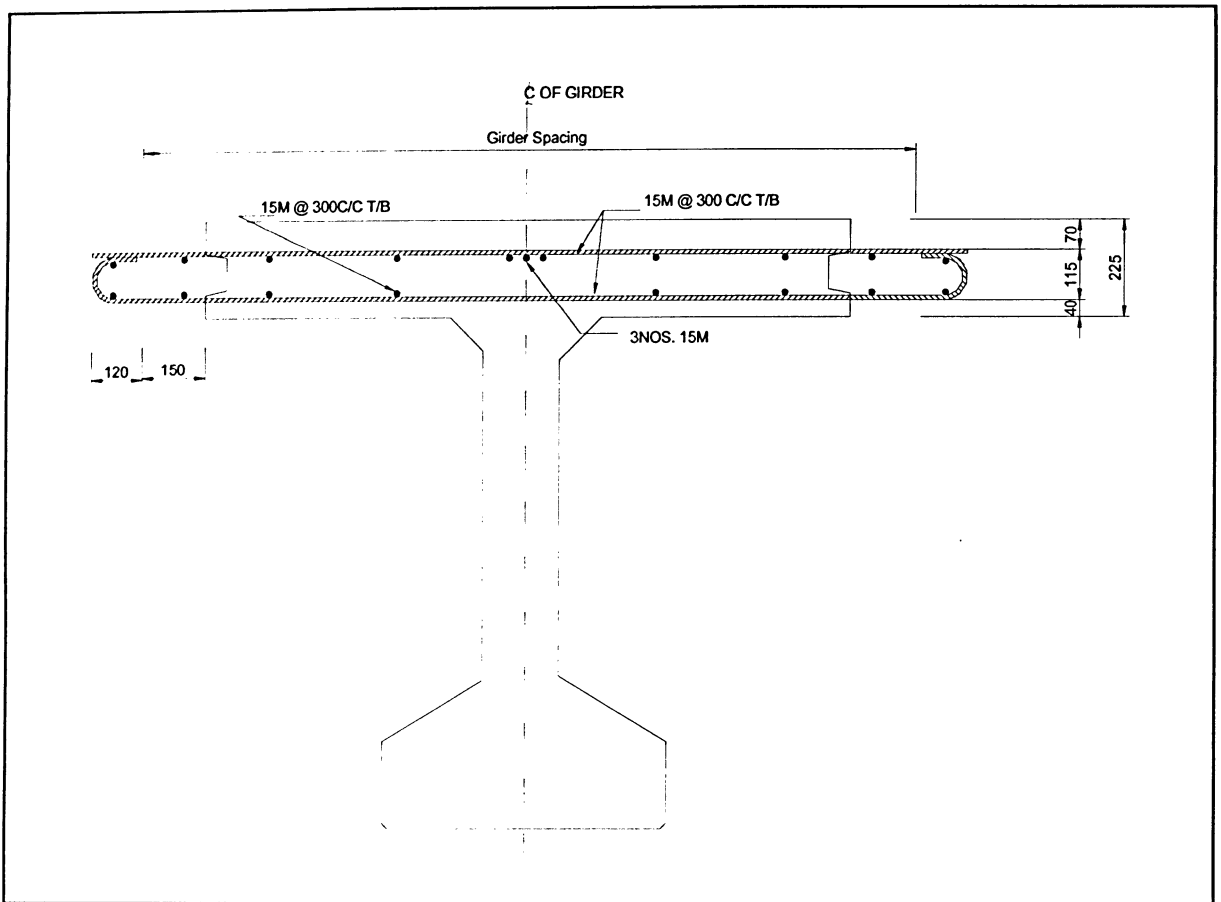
Cross-Section of the MTC-2 girder Connection with Structural Details
